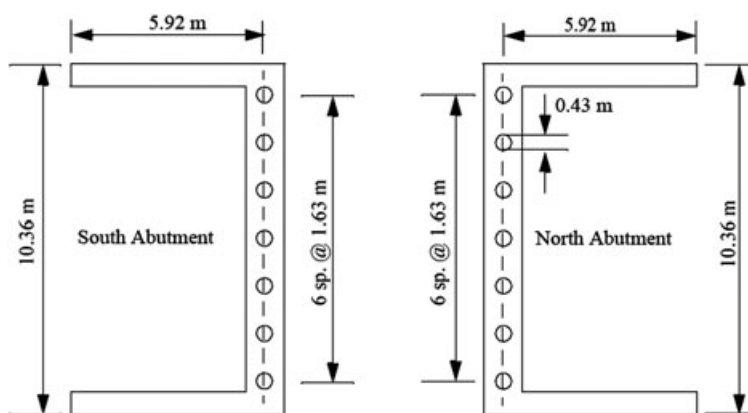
Plan view of south and north abutments of Meloland Road Overcrossing.
